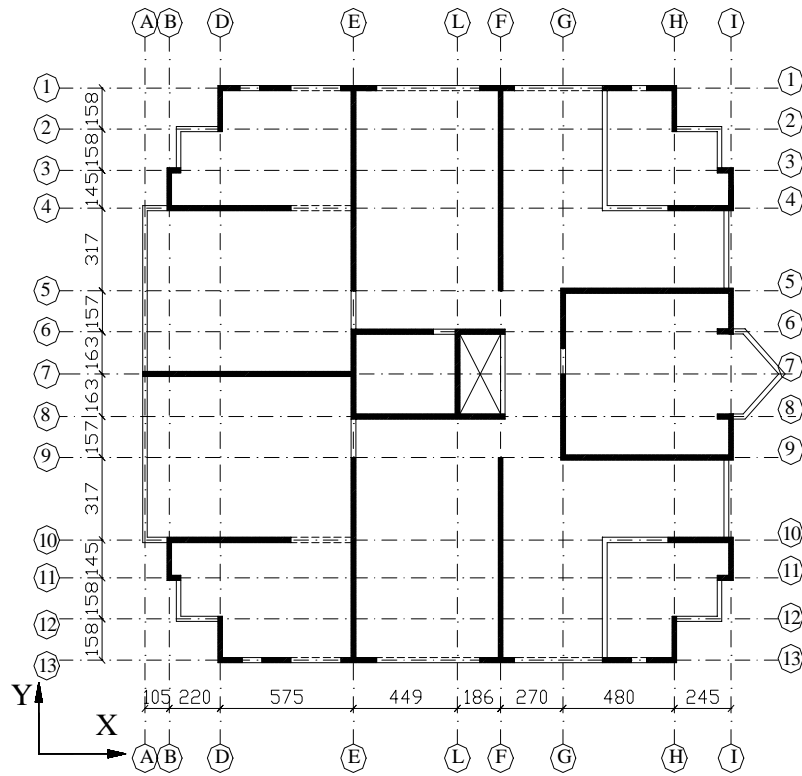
Structural plan Building N°2. (Dimensions in centimeters).
